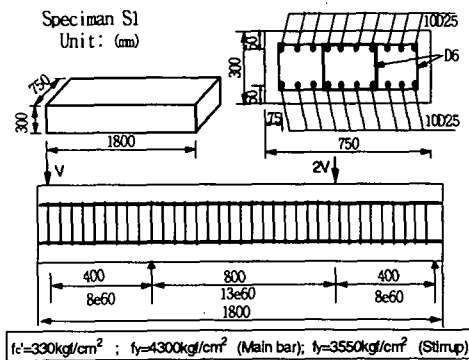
Layout of the specimen used for checking shear transfer effect.
